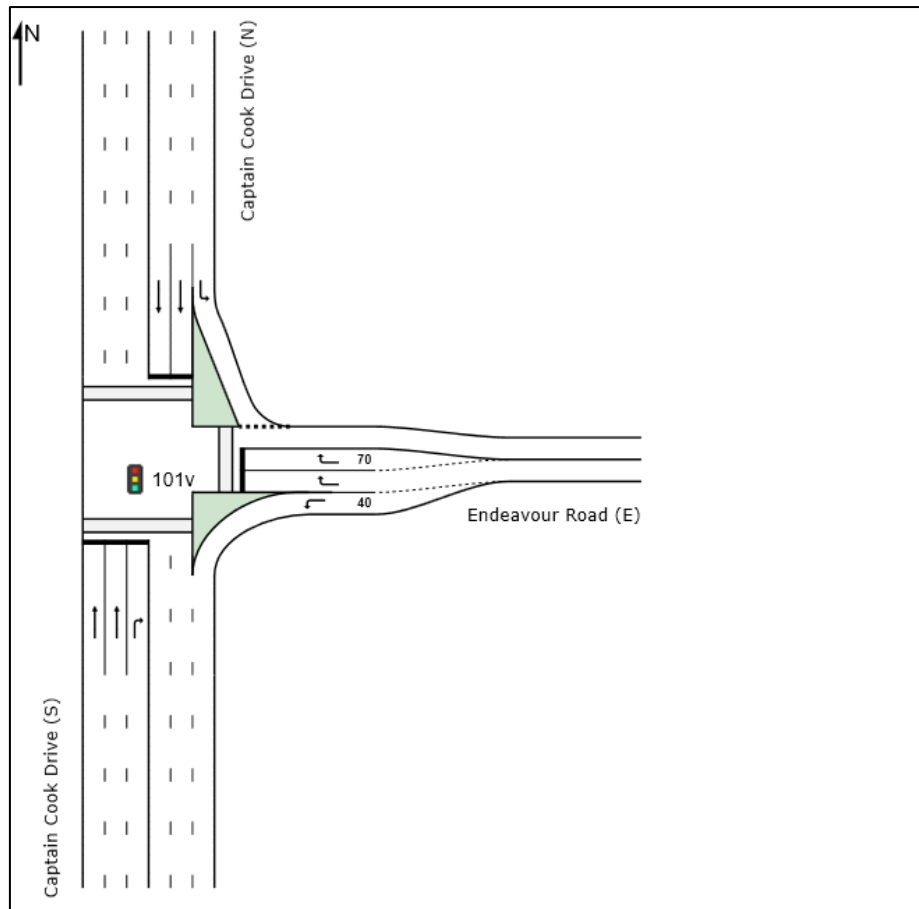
CAPTAIN COOK DRIVE / ENDEAVOUR ROAD INTERIM SIGNALISED INTERSECTION PRIOR TO MASTERPLAN OCCUPATION LEVELS SIMILAR TO EXISTING APPROVED SITE AS OPERATED UNDER TOYOTA
